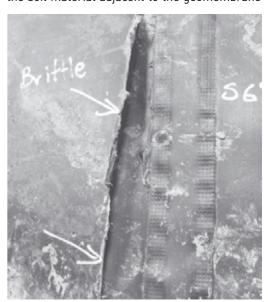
Example of stress cracking on edge of overheated weld [Scheirs]
